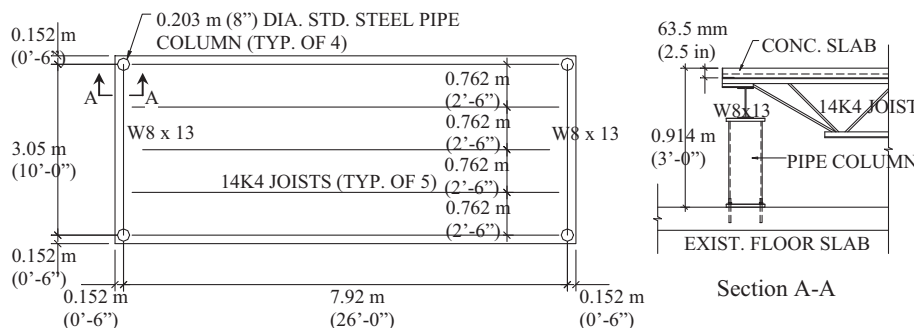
Experimental floor structure, plan and elevation views (from [10]).
